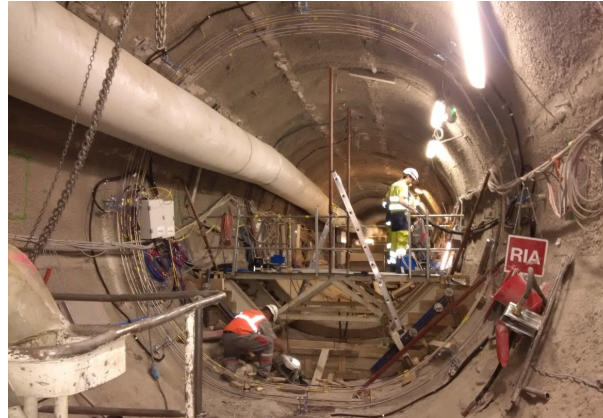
Construction of an ILW-LL repository cell, big as a railway tunnel and with concrete liner.
